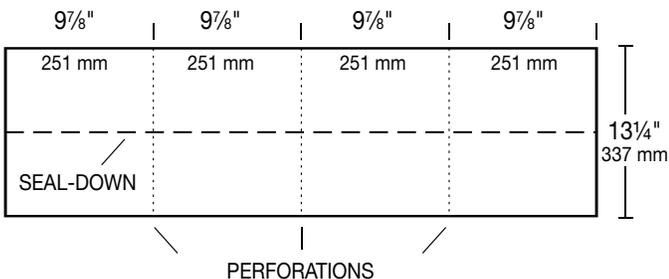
10" RidgeFlex® Hip and Ridge Shingle
